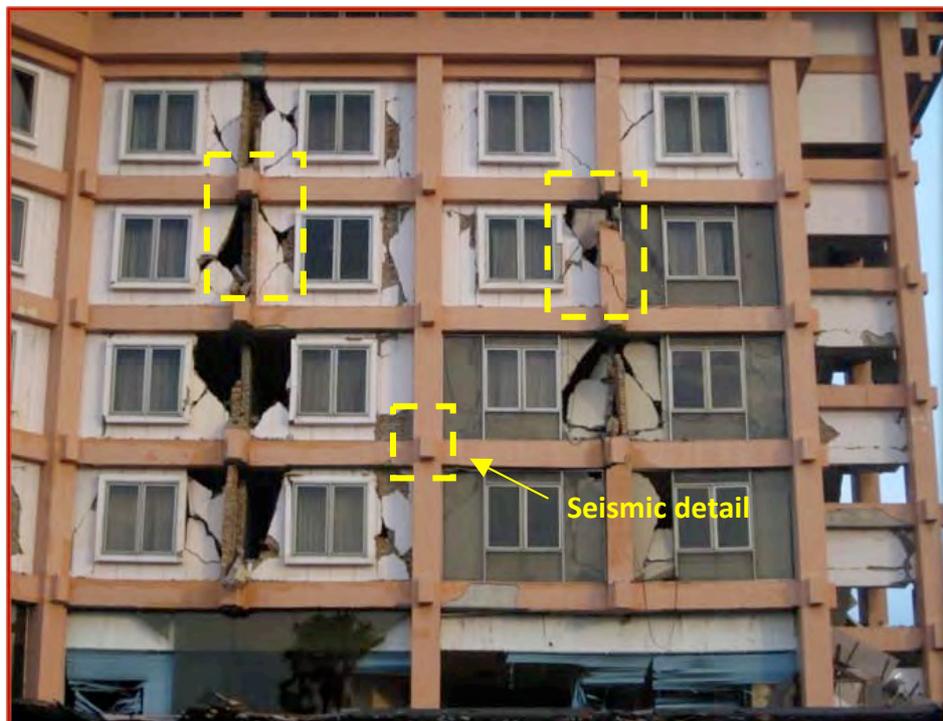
Bumiminang Hotel, shear cracking and damage to false masonry columns.
